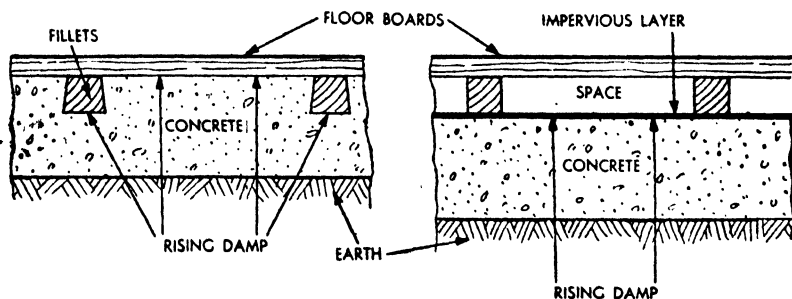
Dry rot caused through the underside of the concrete being exposed to damp which creeps up the fillets to the floor boards. This can be prevented by the insertion of an impervious layer (right) between concrete and fillets.
